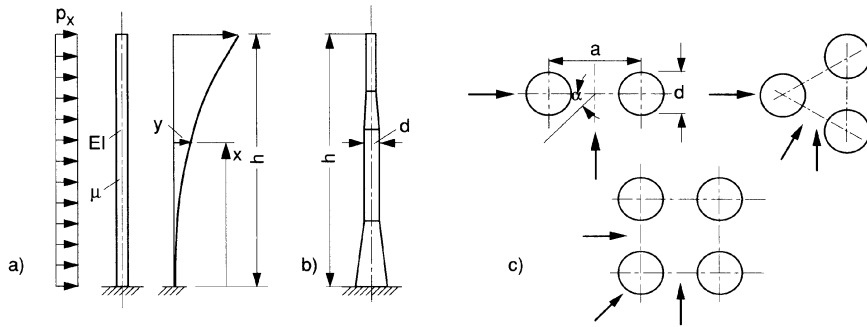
Chimney as structural system: a) dynamic wind action and deflected shape, b) stepped chimney, c) group arrangements
